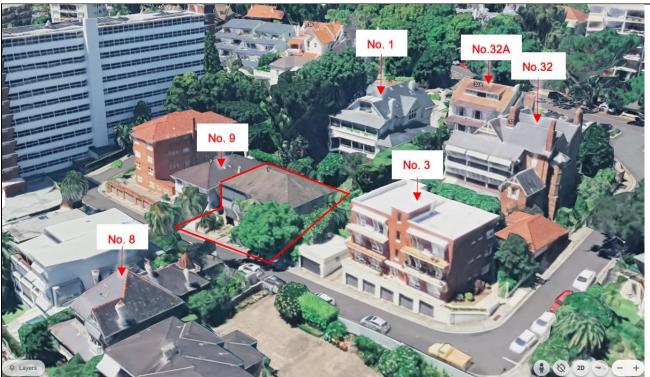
Arial view demonstrating the surrounding (natural and built environment) of the subject site.
